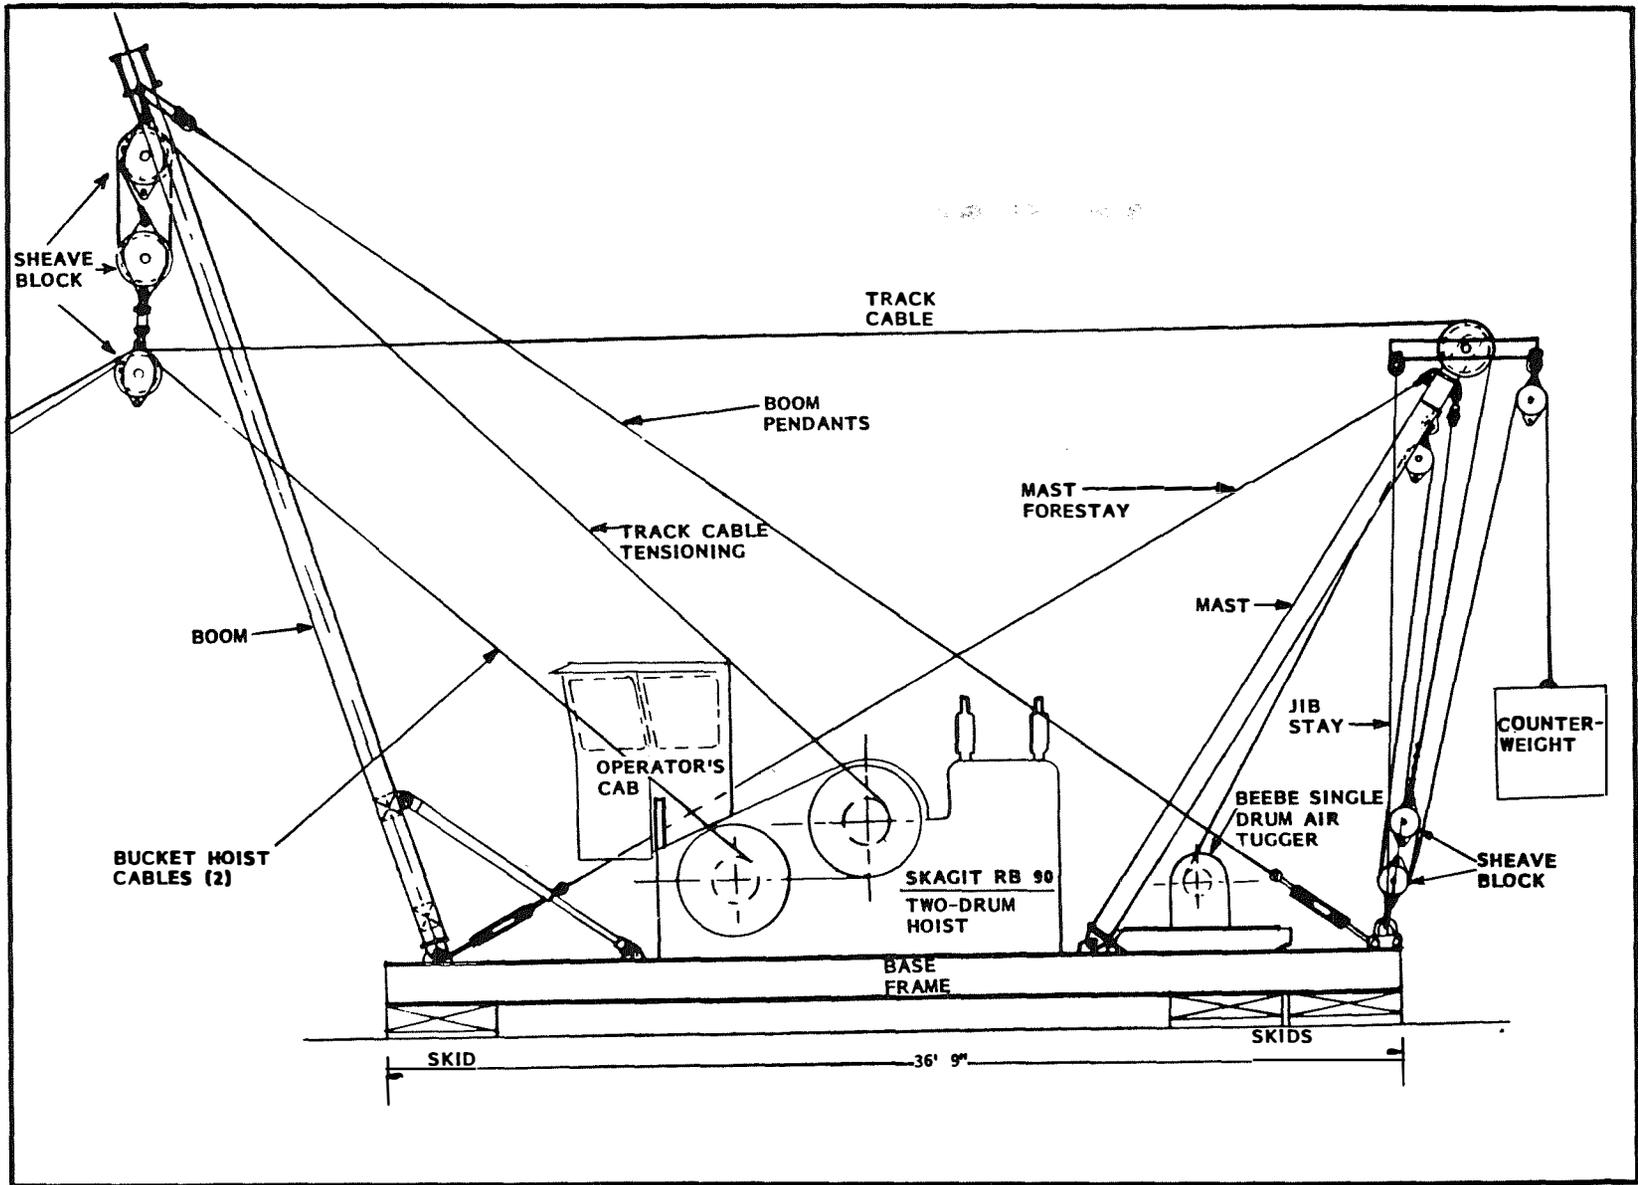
DEMONSTRATION TEST SURFACE MACHINE
